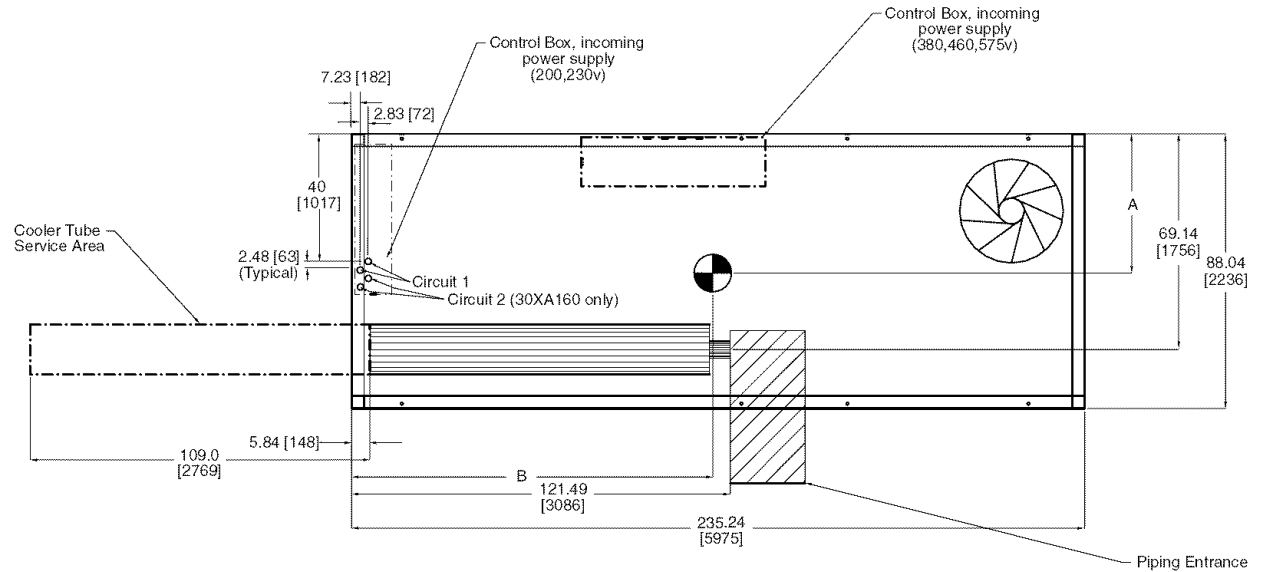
30XA090-120 Air-Cooled Liquid Chiller Dimensions (cont)
